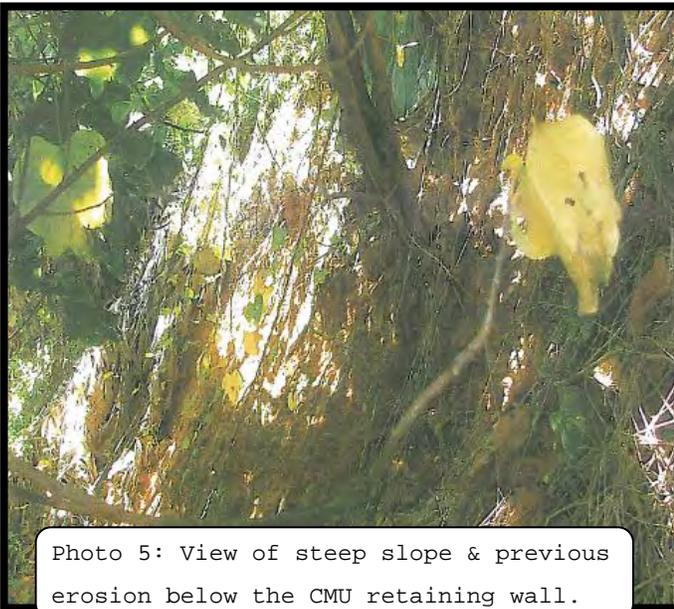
View of steep slope & previous erosion below the CMU retaining wall.
